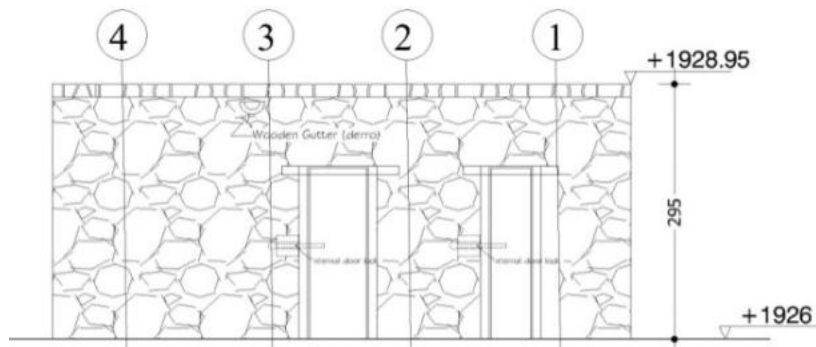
124 East Elevation of W/ro Shemshu Ahmed's house.
